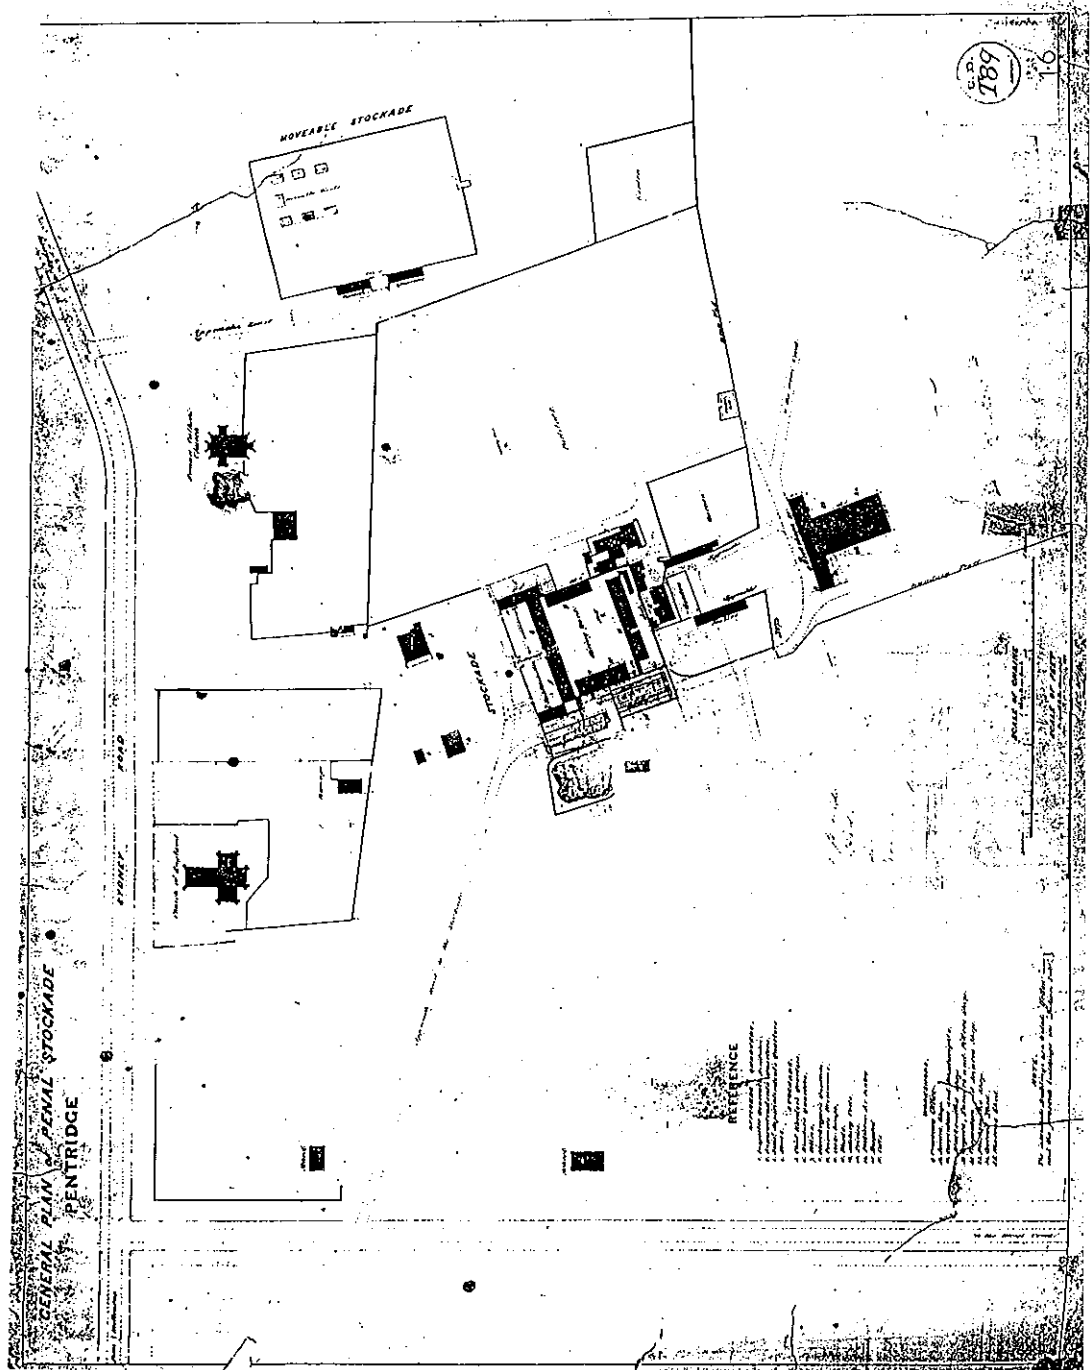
General Plan of Pentridge Stockade, 1854. Office of Building microfilm no. PGP 1.1.6.
